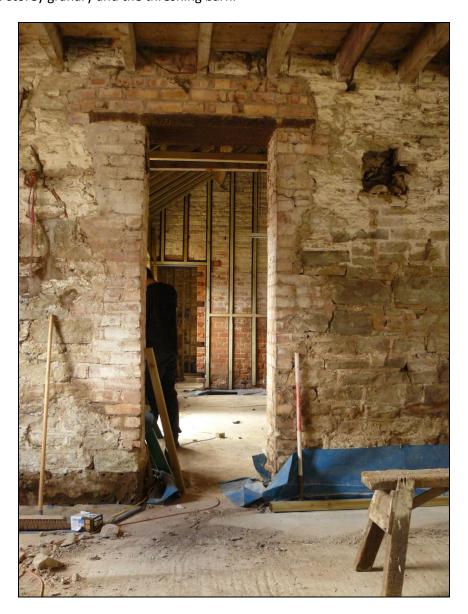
Internal view of Building 2 looking SW showing modern doorway with brick surround inserted into wall of two storey stable and hayloft
